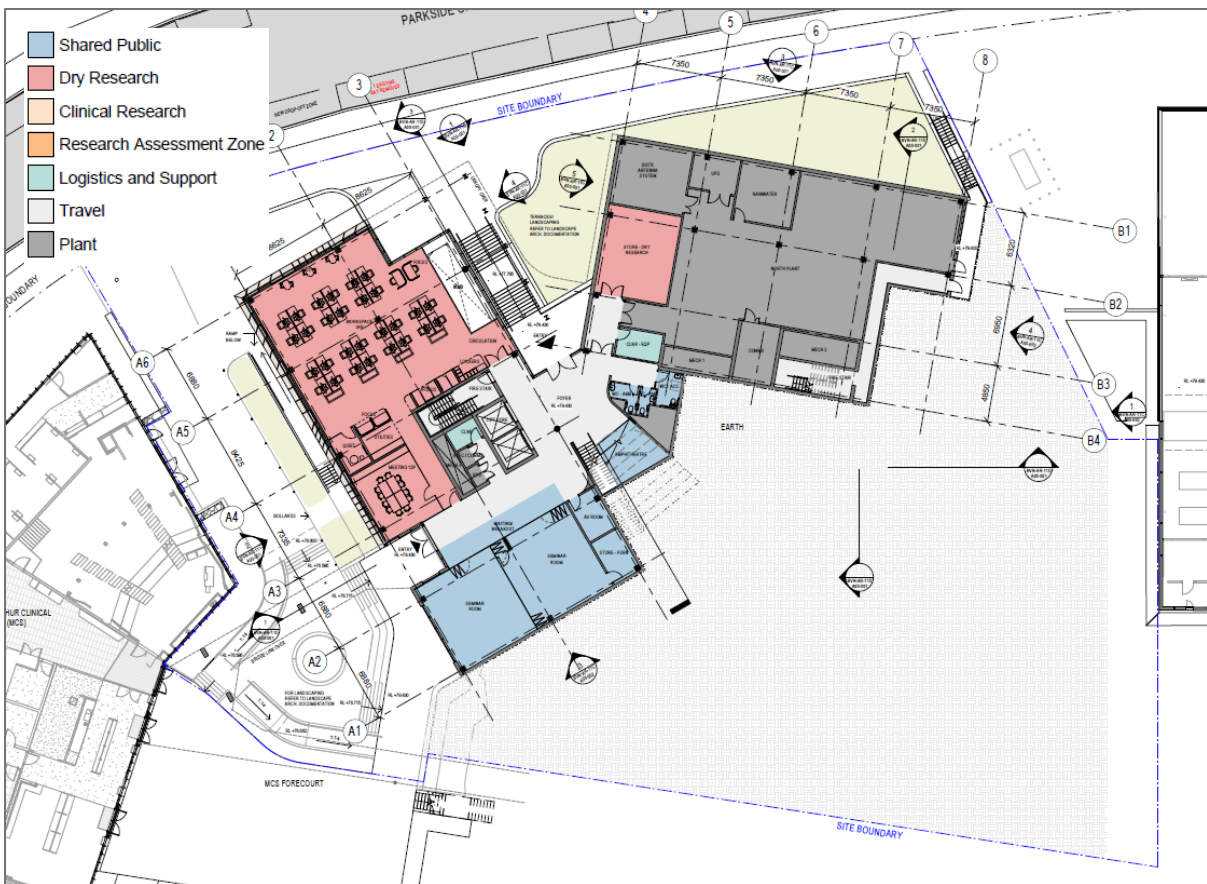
Proposed lower ground level 01 plan. Source: BVN
